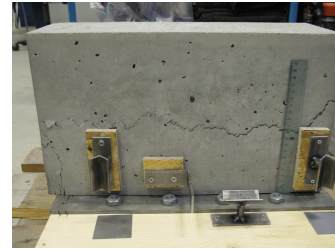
Picture of the failure in the concrete (Test series S-8S-65)
